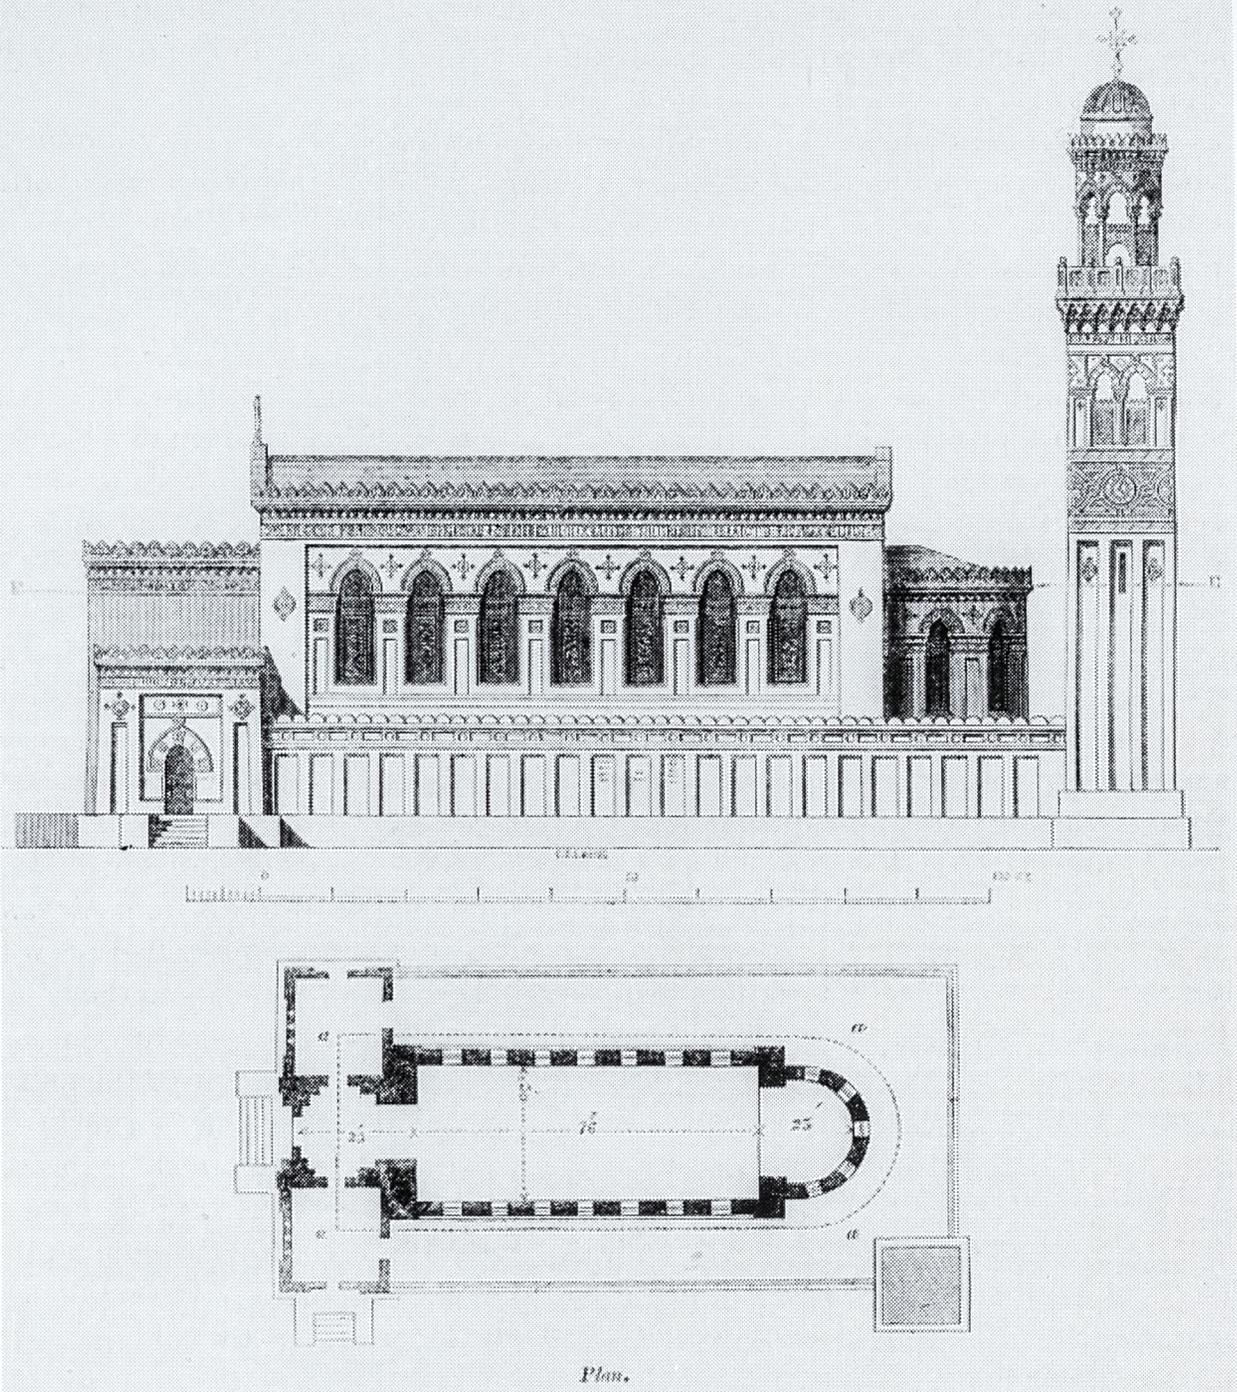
St. Mark's, Alexandria, 1846, engraving of side elevation and plan (*Builder*, 1846).
